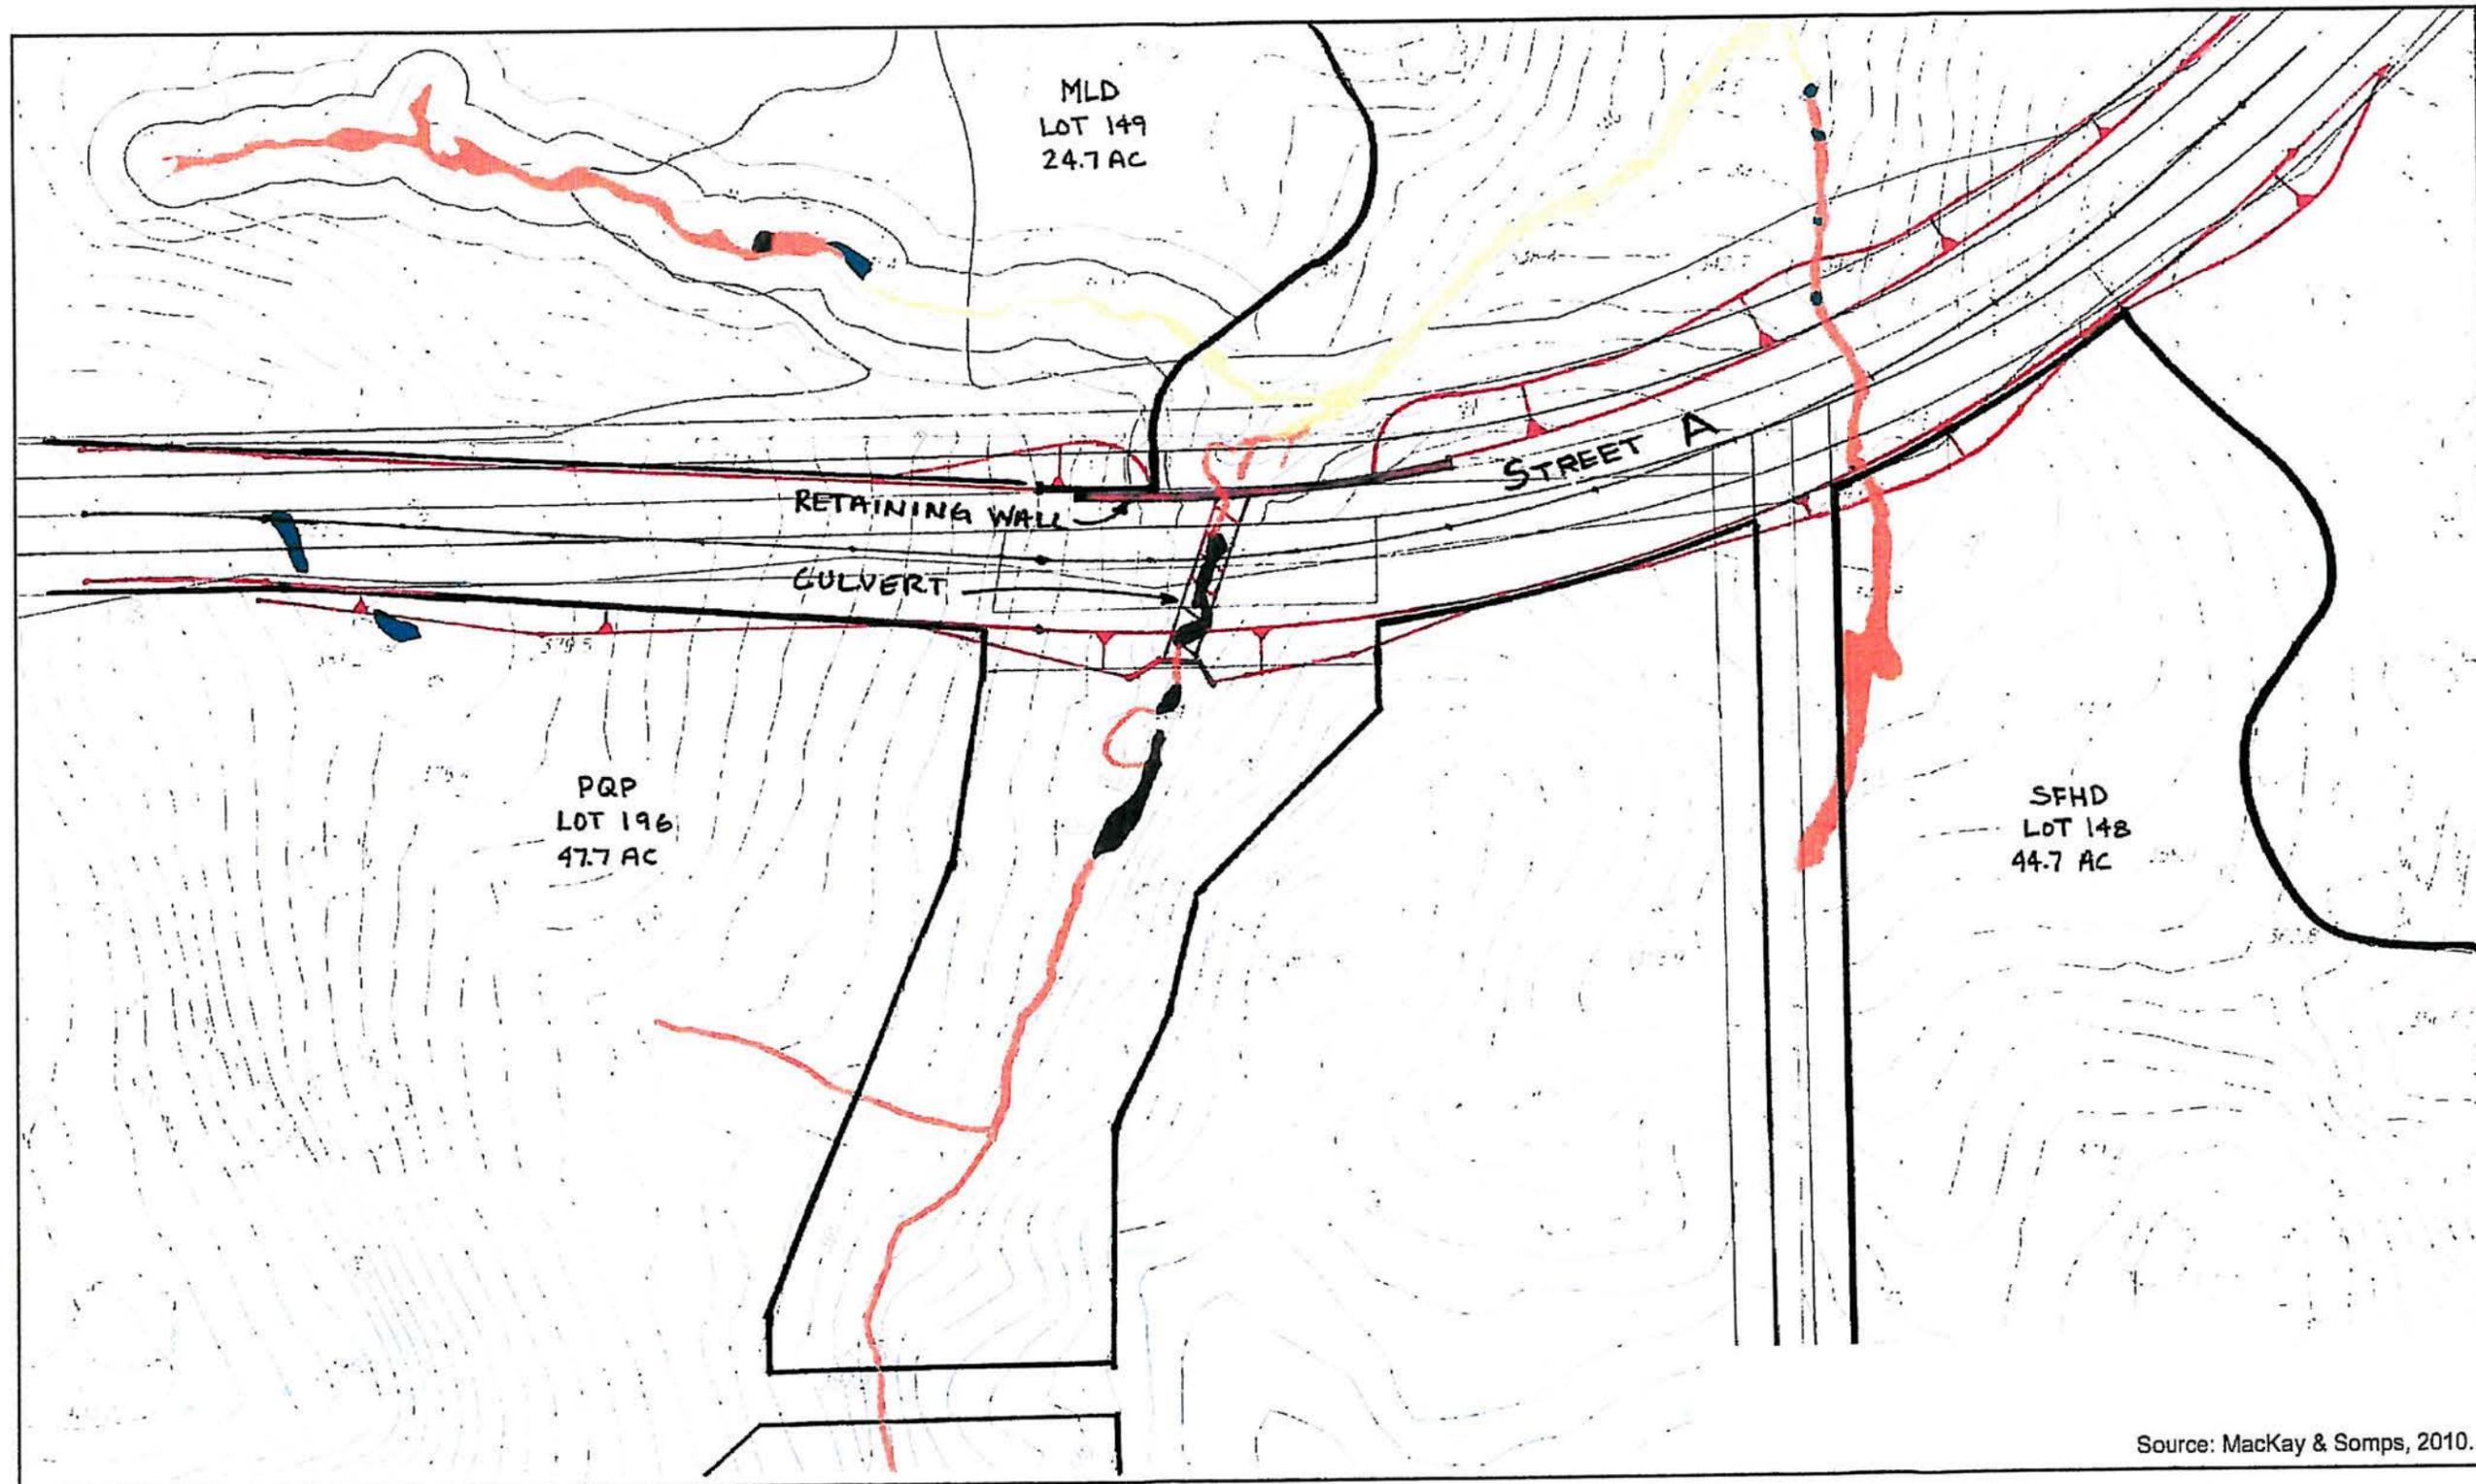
Conceptual Land Use Plan - Street "A" Alternative
